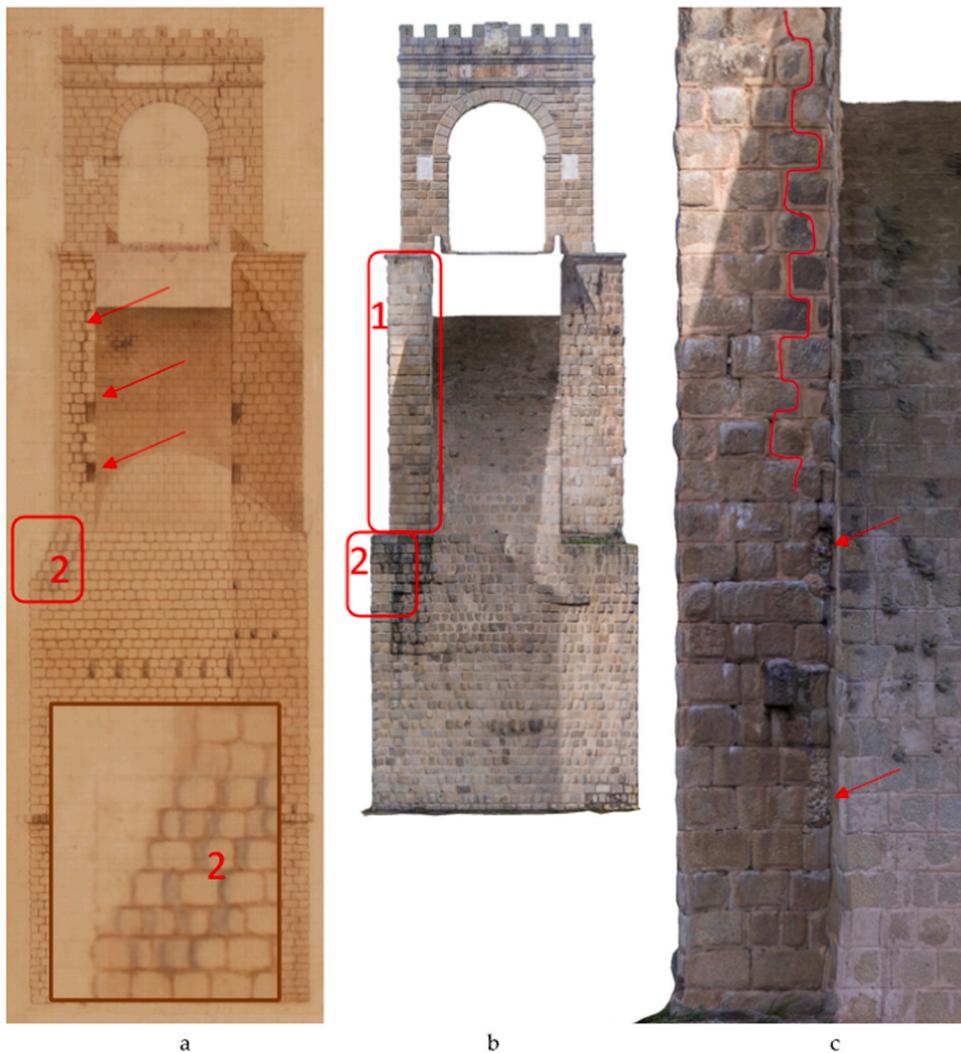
Elevations of the central pier (3) as seen from arch 3: (a) survey by Millán [40], in zone 2, the pier cap heightening is faintly profiled (b) orthophoto of the drone survey and (c) detail of orthophoto with the repairs that have been carried out in zone 1 marked in (b).
